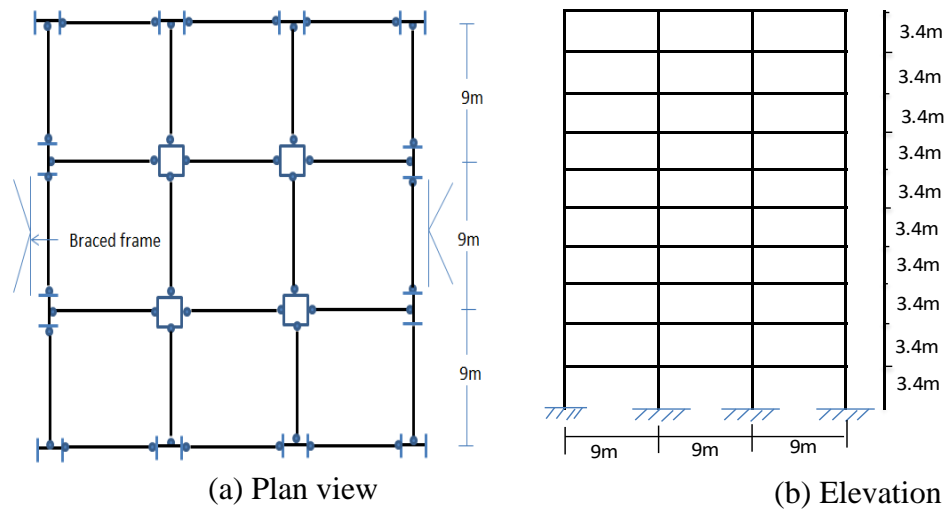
7: Plan and elevation of selected 10-storey building [21]
